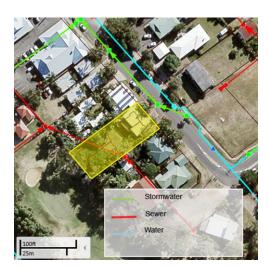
Local Gov. services plan (source: BRC website 1st June 2019)
